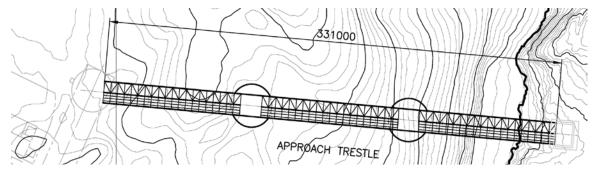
Plan, Approach 1 for Steensby Island Ore Trestle (see Appendix A)
